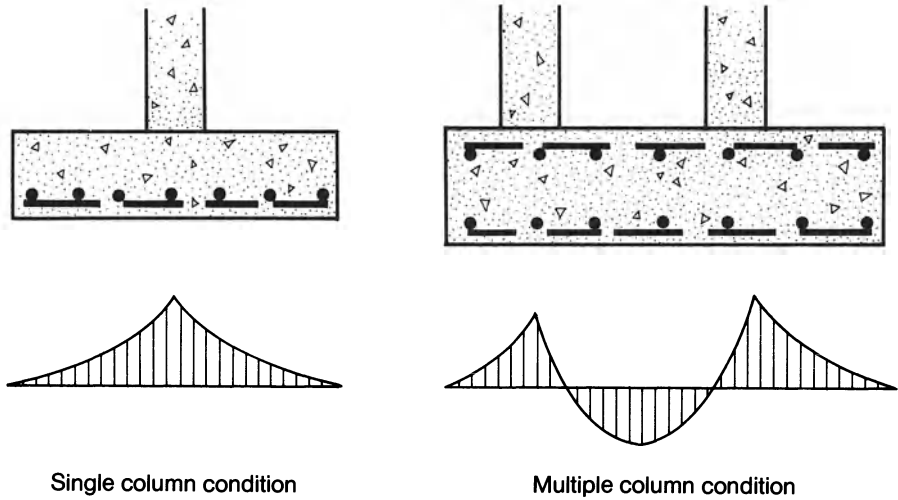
Typical reinforcing arrangement in footings for single and multiple column conditions.
